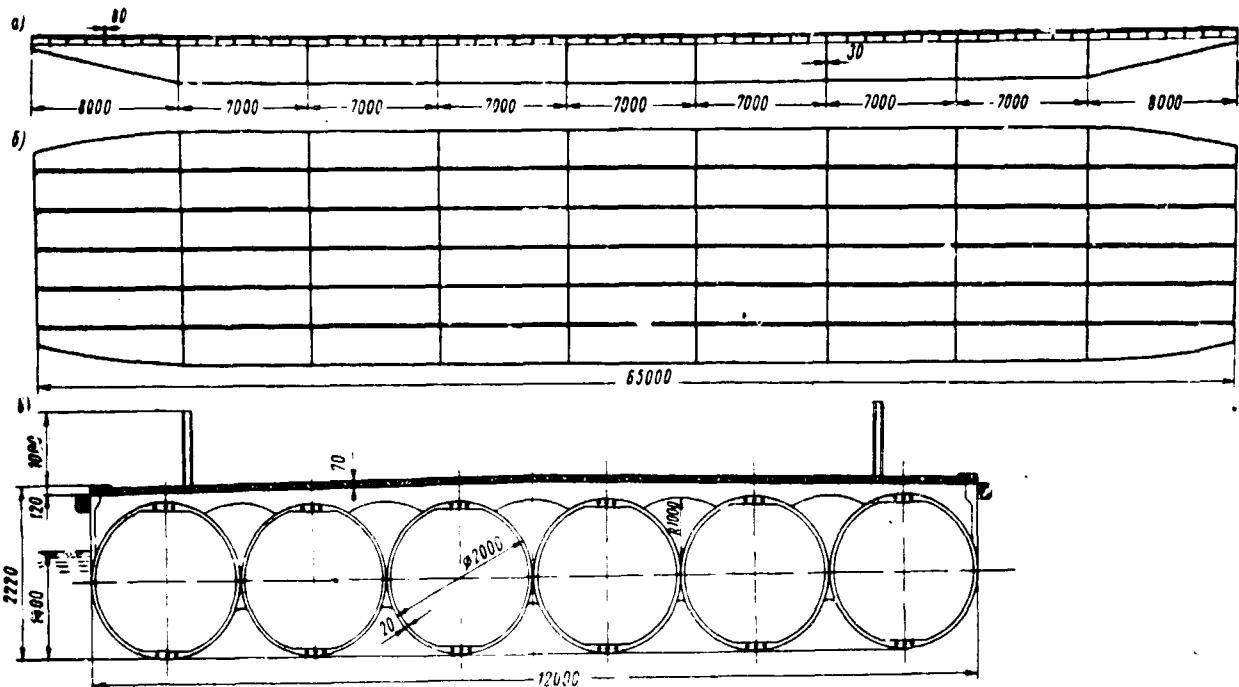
Barge-Platform Made of Reinforced Concrete: a - section along DP; b - plan of barge with deck covering removed; c - transverse section.
